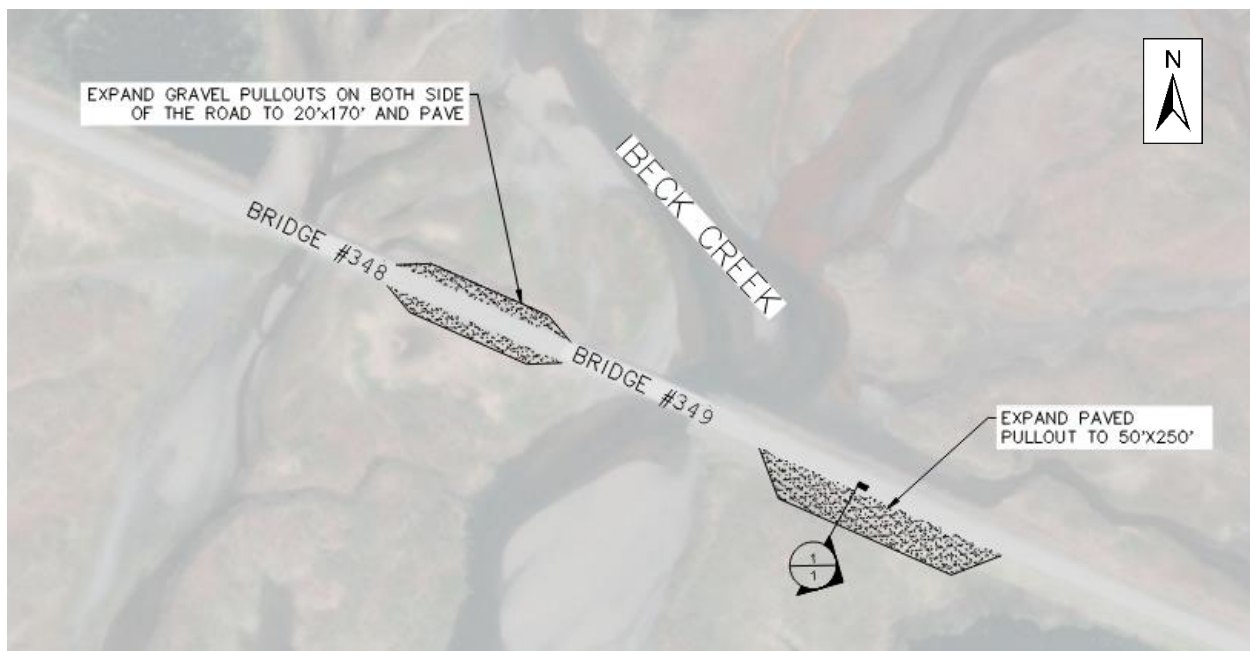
Proposed Parking Improvements at Ibeck Creek, MP 7.5.
